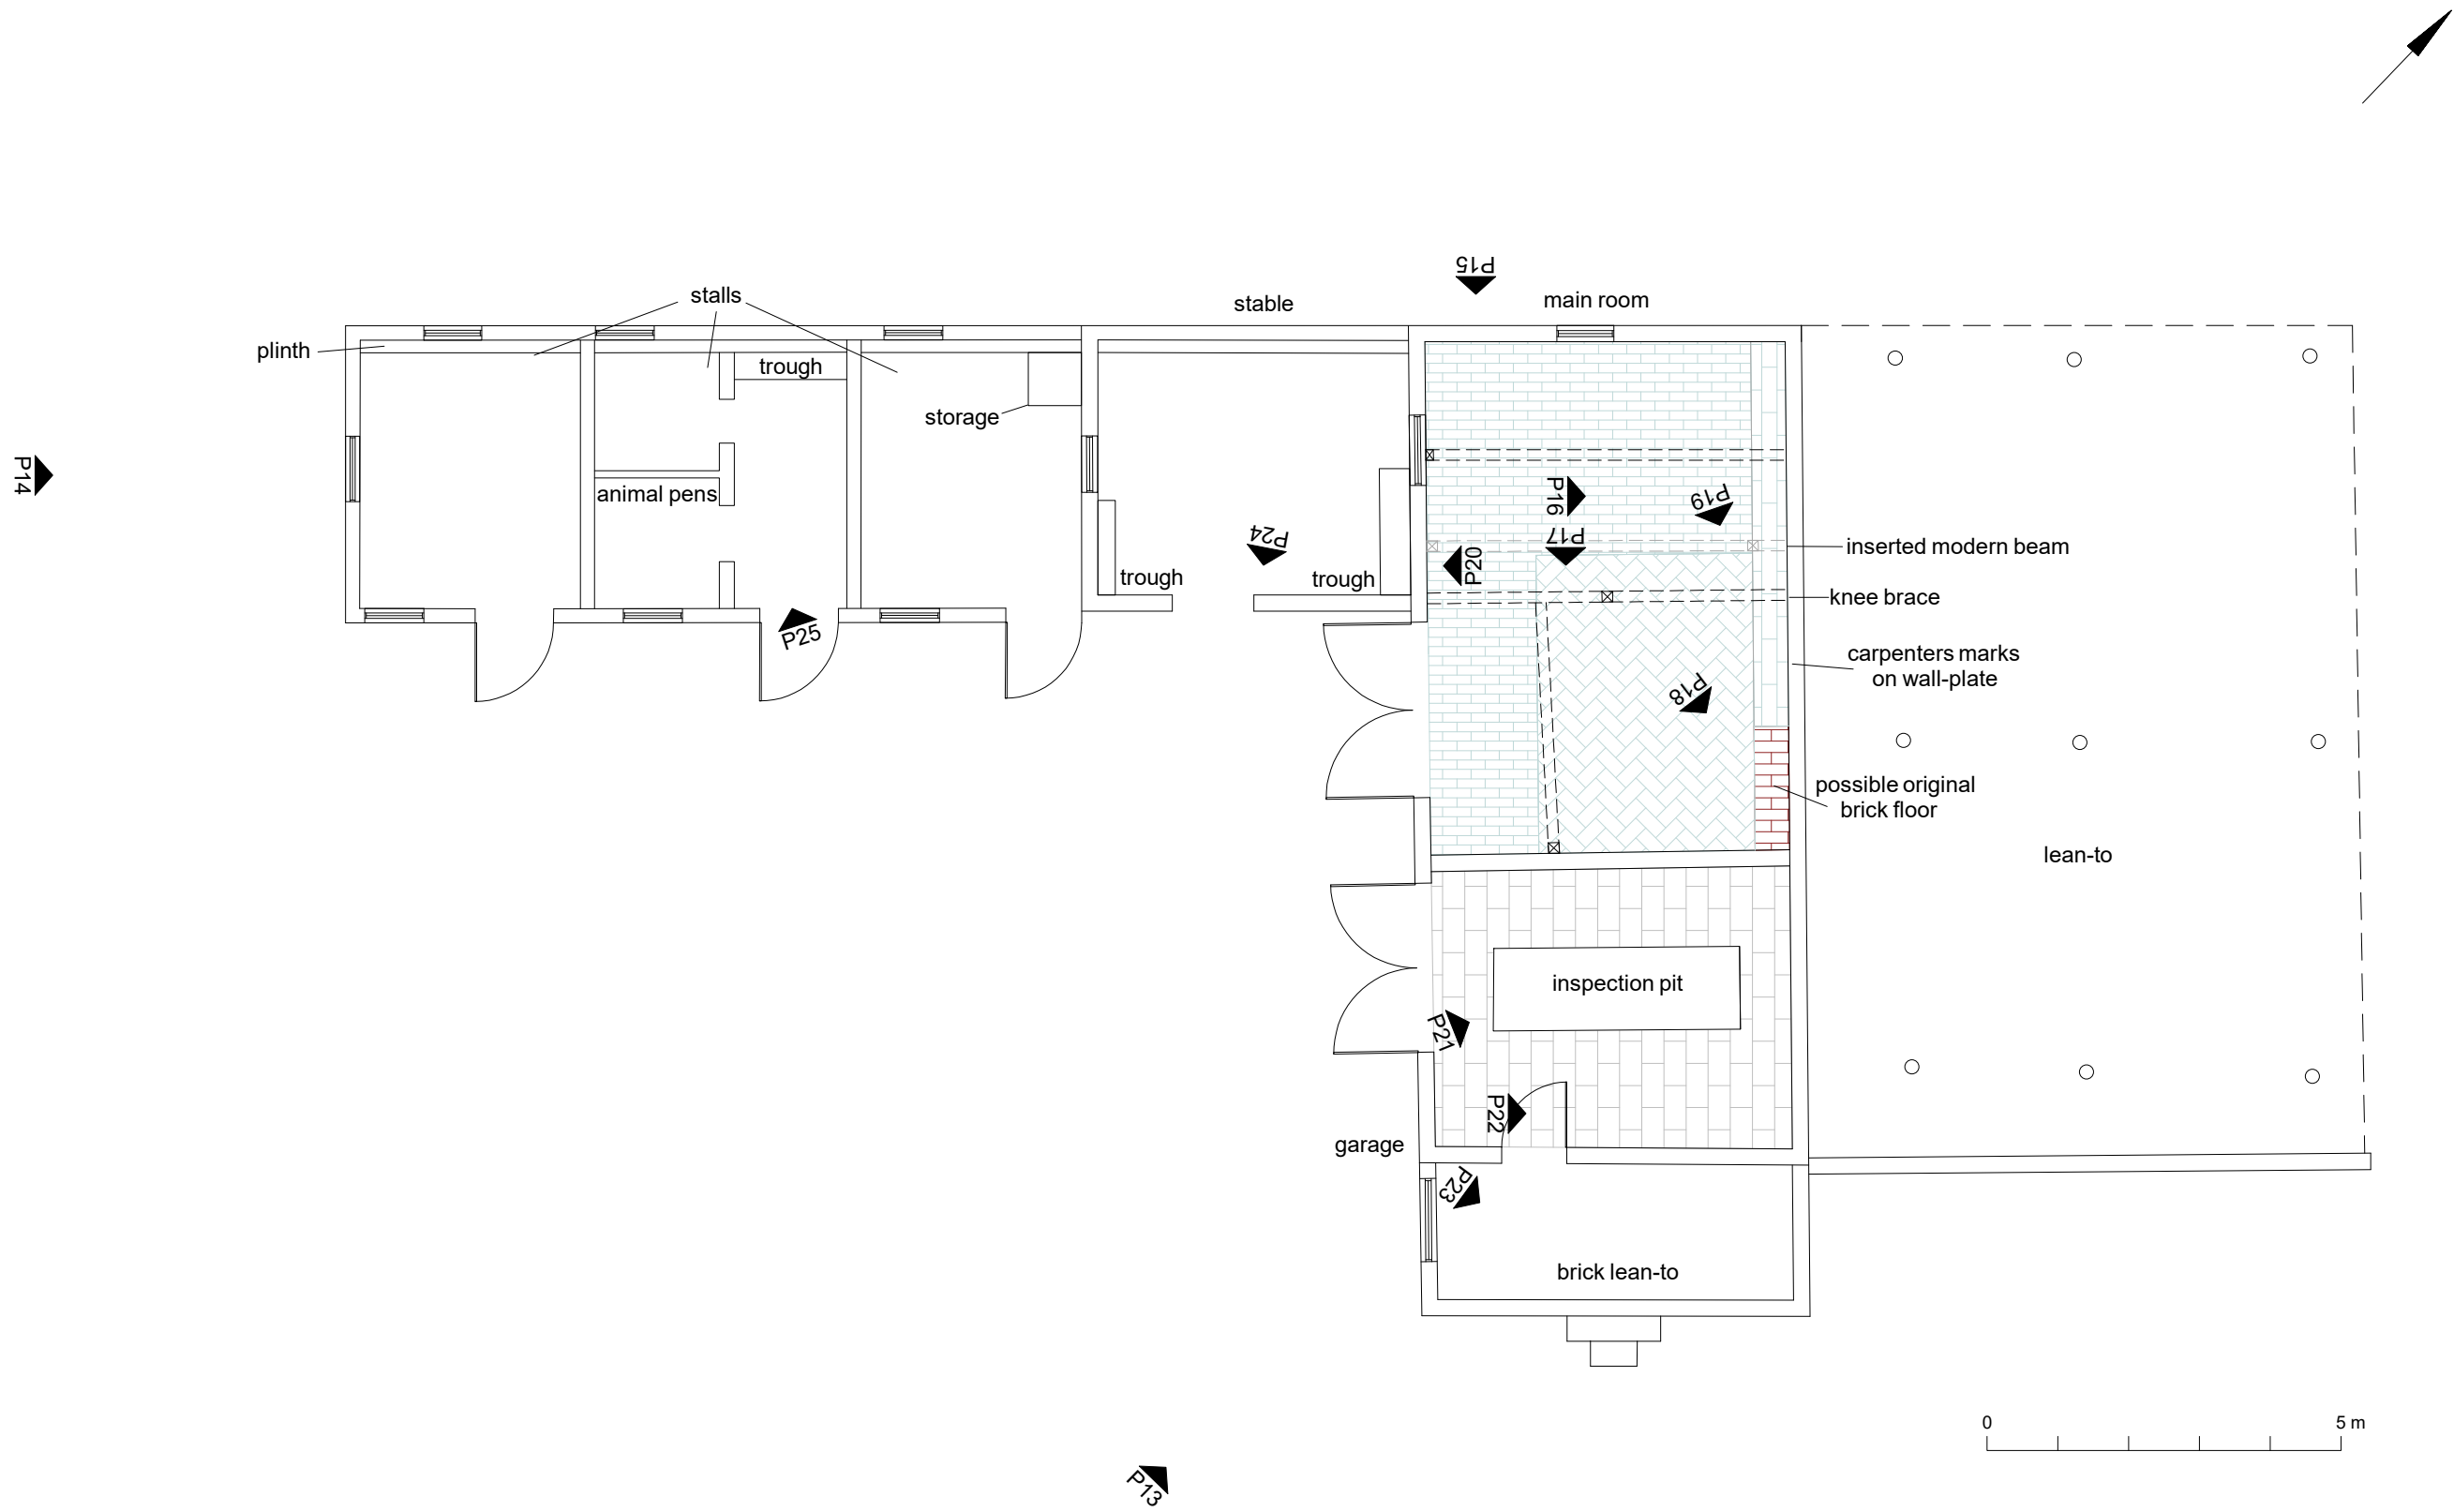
Coach House floor plan. Location and direction of photographs reproduced in text shown.
